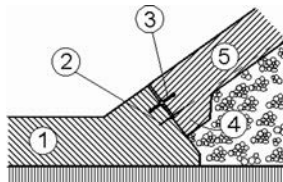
Perimeter joint at Cethana dam. (1) Concrete plinth; (2) waterstop of copper sheet; (3) rubber waterstop; (4) concrete bedding; (5) slab of the facing.
